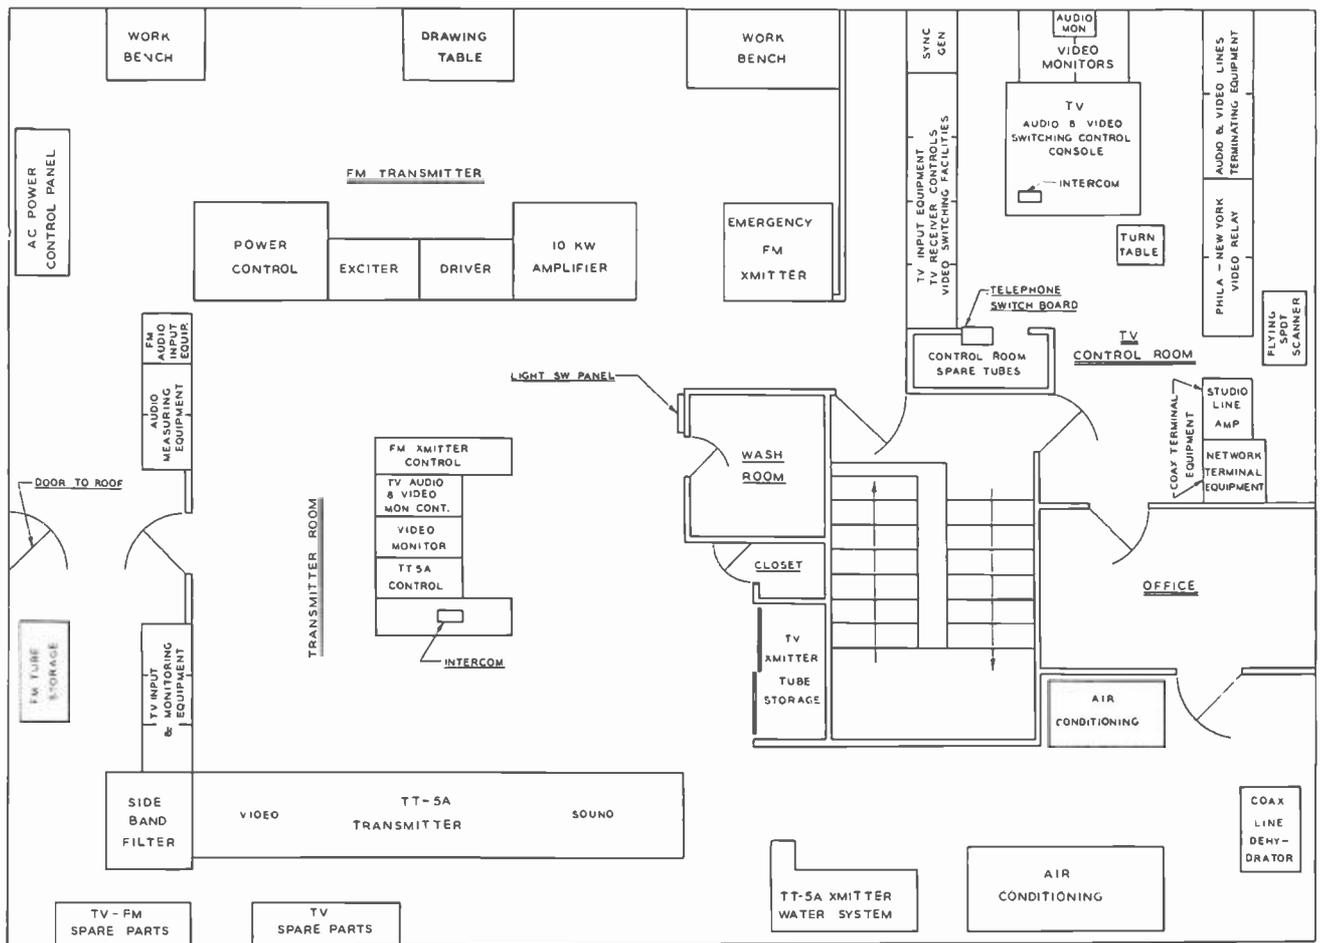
Floor plan of WCAU-FM-TV transmitter installation showing arrangement of all major equipment items. Note provision of a separate TV Control Room containing terminal equipment as well as switching and monitoring equipment.
